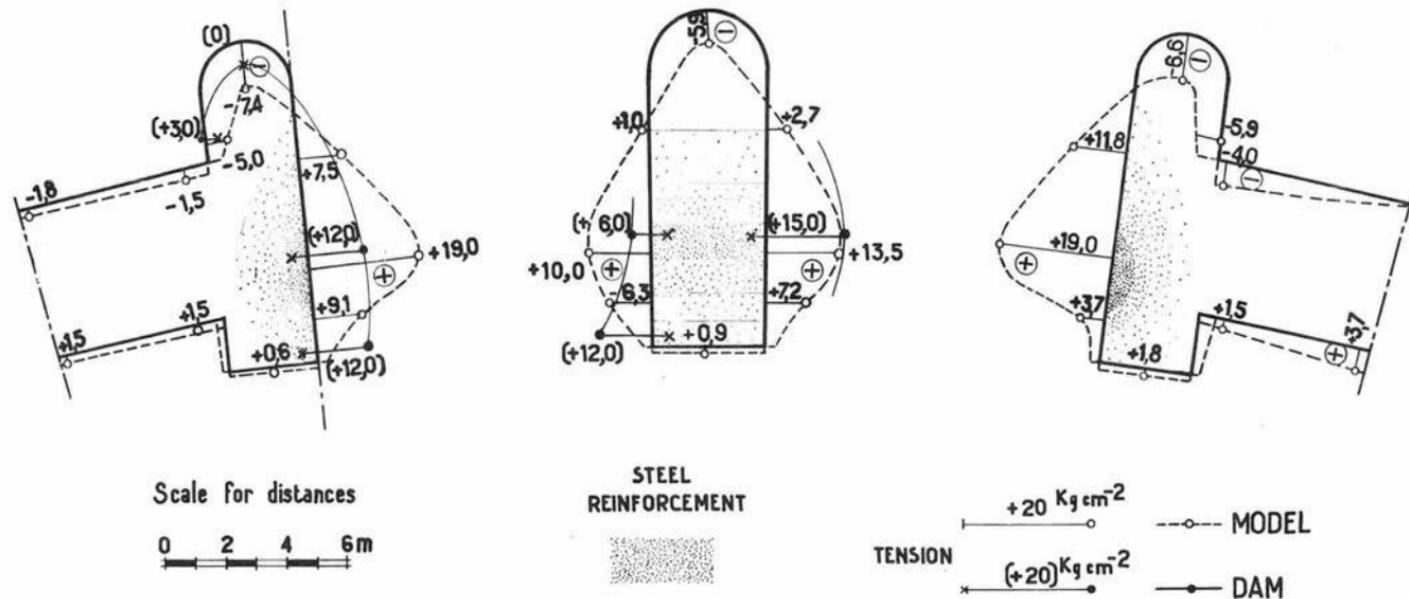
VENDA NOVA DAM. Vertical stresses in a horizontal section of the spillway openings.
